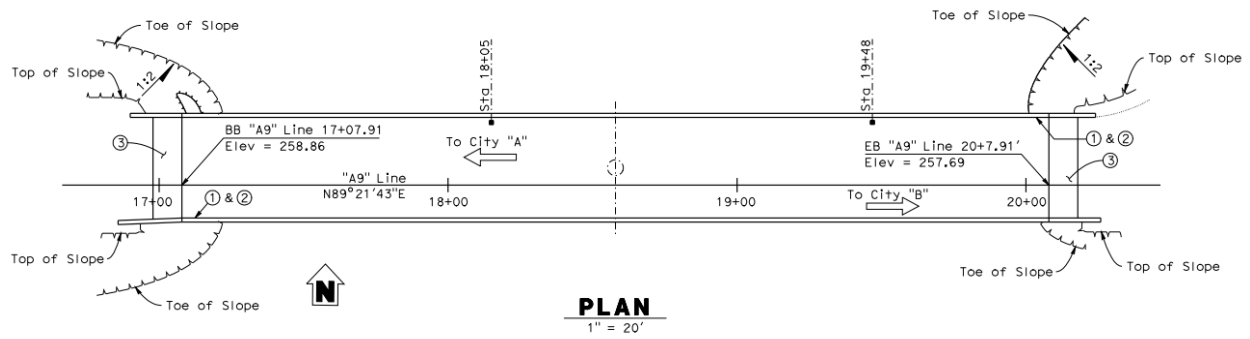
Schematic Plan view of OSB2 bridge (drawing provided by Caltrans)
